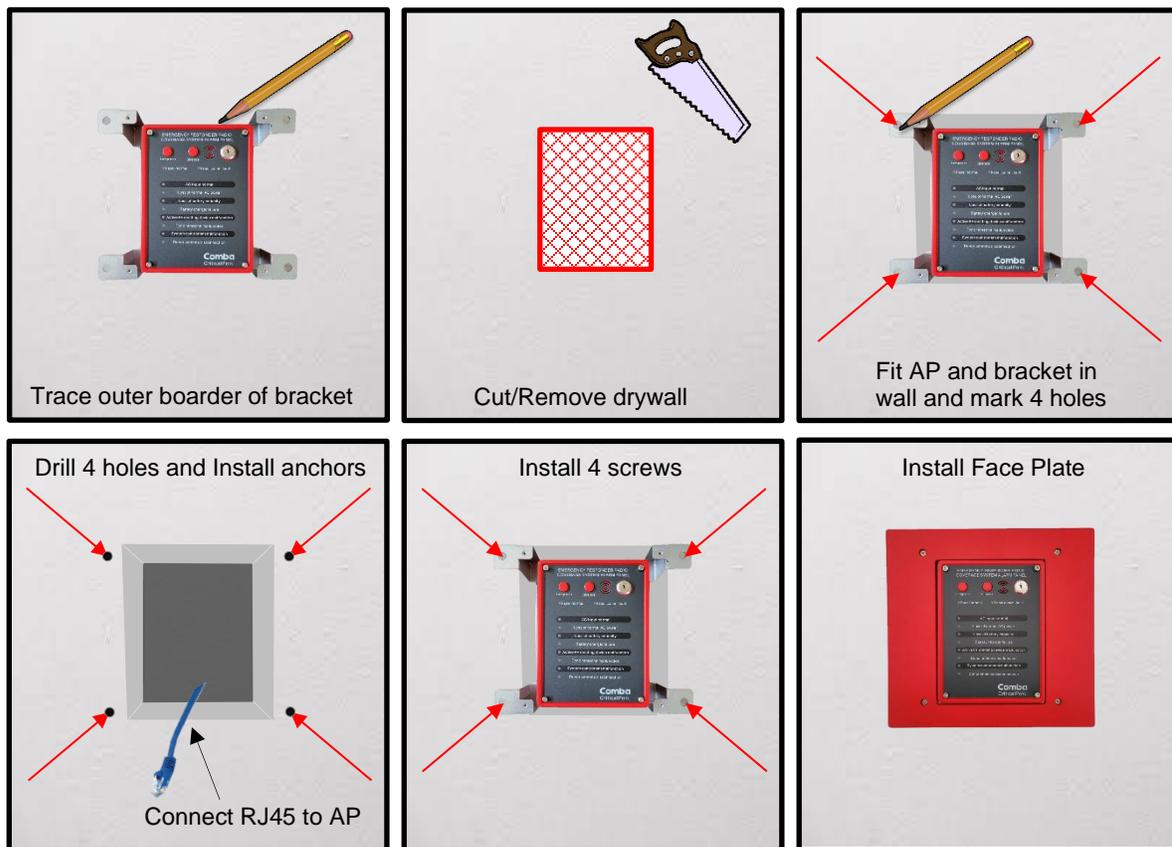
APV3-BDA - Installing Flush Mount Bracket, APV3-BDA, and Face Plate into a Wall
